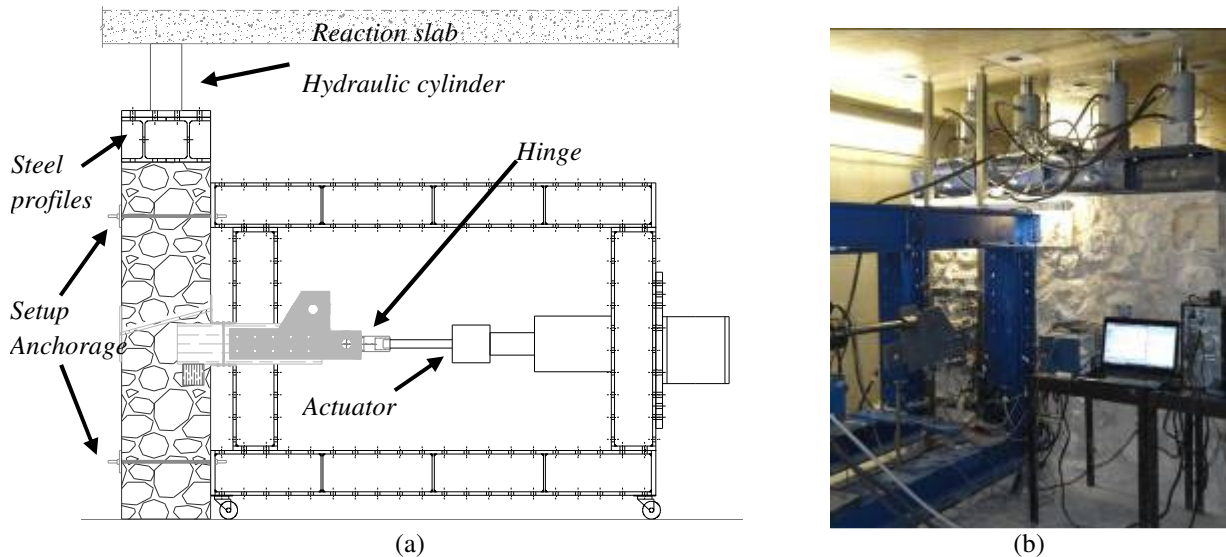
Set-up for the pull-out test: (a) sketch with the main components; (b) photograph taken during WF.40.A.1A test
